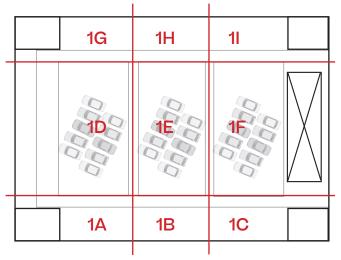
Floorplan of the parking level, divided in nine zones, fire in zone 1E.
